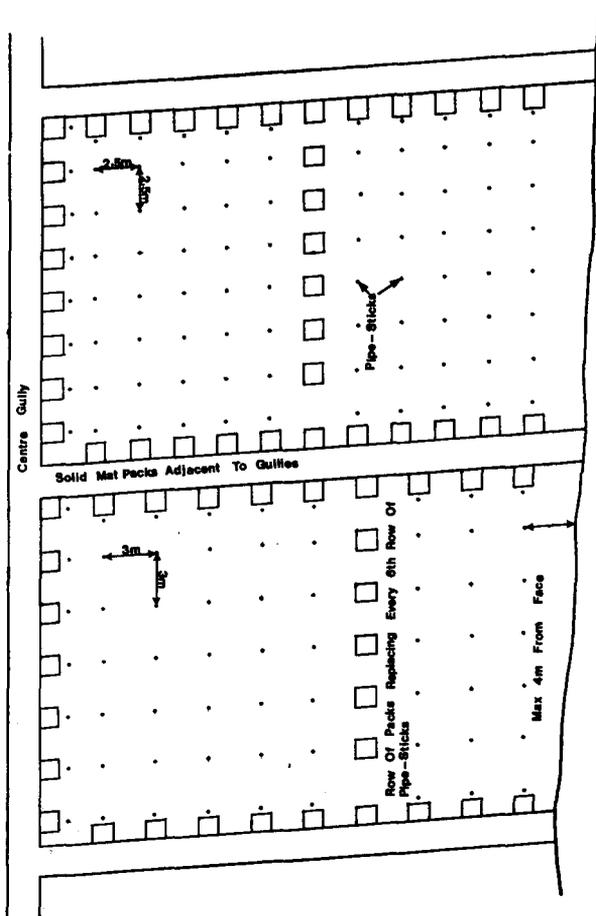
Typical stope-support layouts using pipe-sticks in 20 m panels at spacings of 2,5 m by 2,5 m and 3,0 m by 3,0 m
